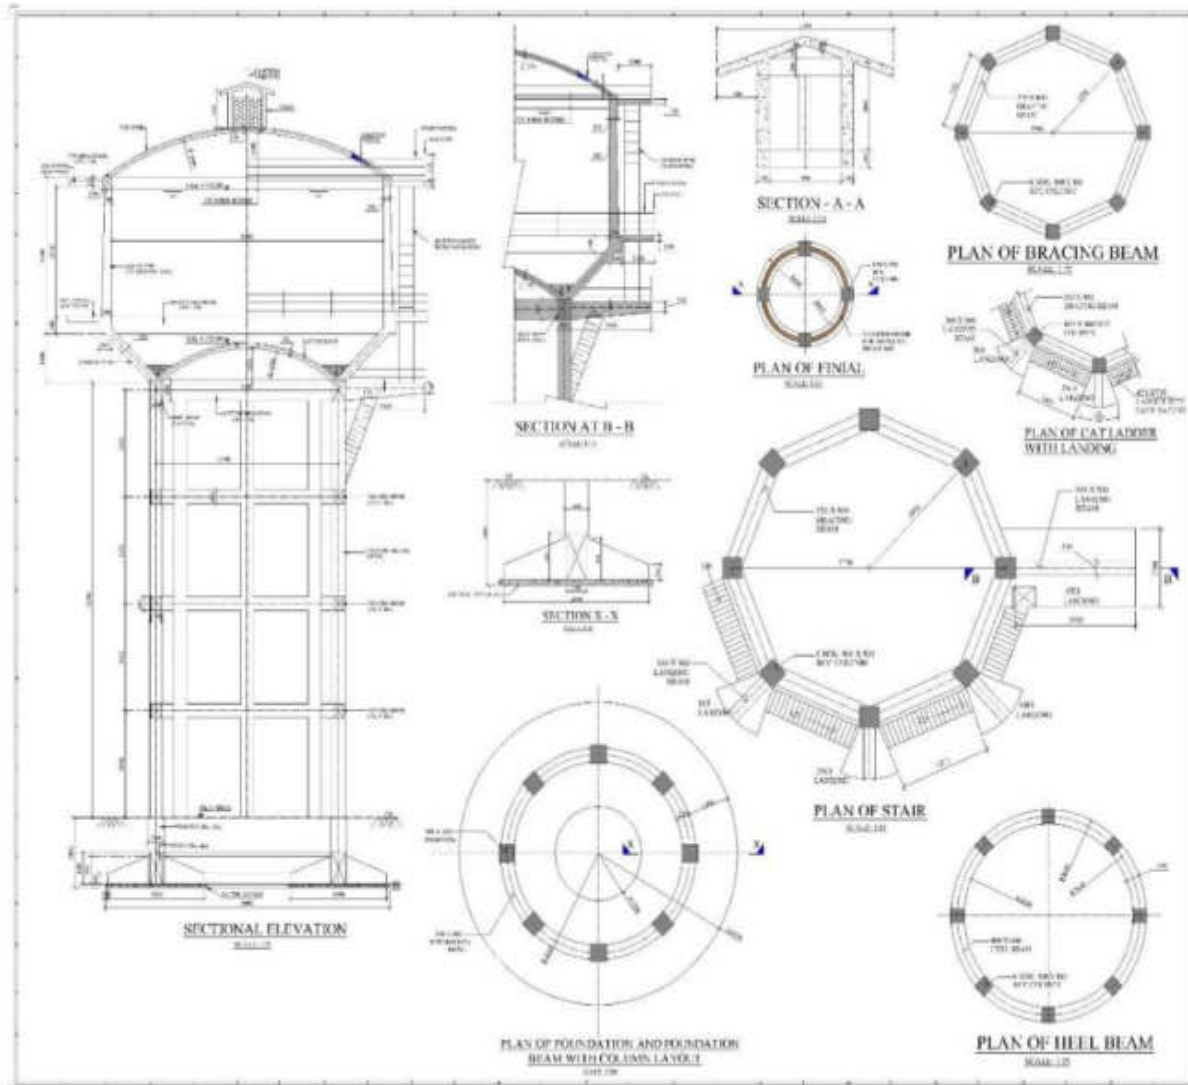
Proposed Layout Plan of OHT at Balnad zone-6A
